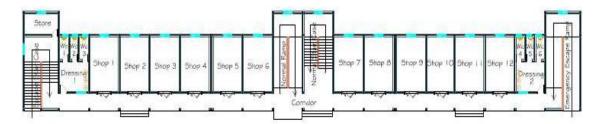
Proposed floor plan of a market building with an emergency escape ramp.
